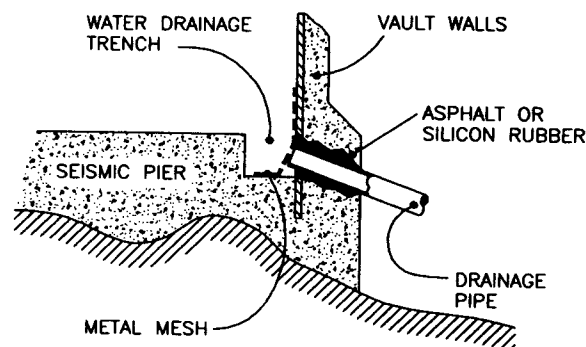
Water drainage pipe and vault trench around the seismic pier.
